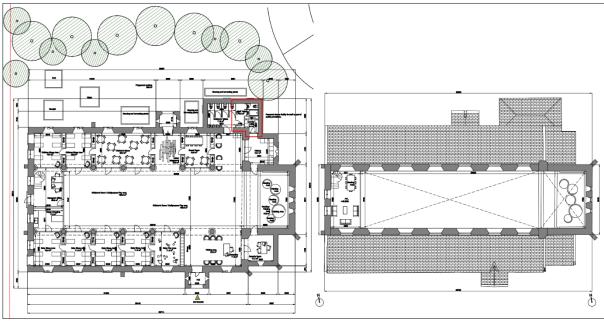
General arrangements of proposed rooms to be inserted around the central former nave of former chapel building which will be retained as full-height open space with children's room or multipurpose play are use. All inserted stud-wall partitions will be potentially reversible with no permanent interventions to historic masonry walls. All necessary services will be routed within inserted partitions to minimise chasing of original walls although any necessary ducting in historic masonry walls will be incorporated in repaired internal plaster build-up where possible. No cut stone detail will be interfered with as part of proposed works. (Drawings after Reddy Architecture and Urbanism)
